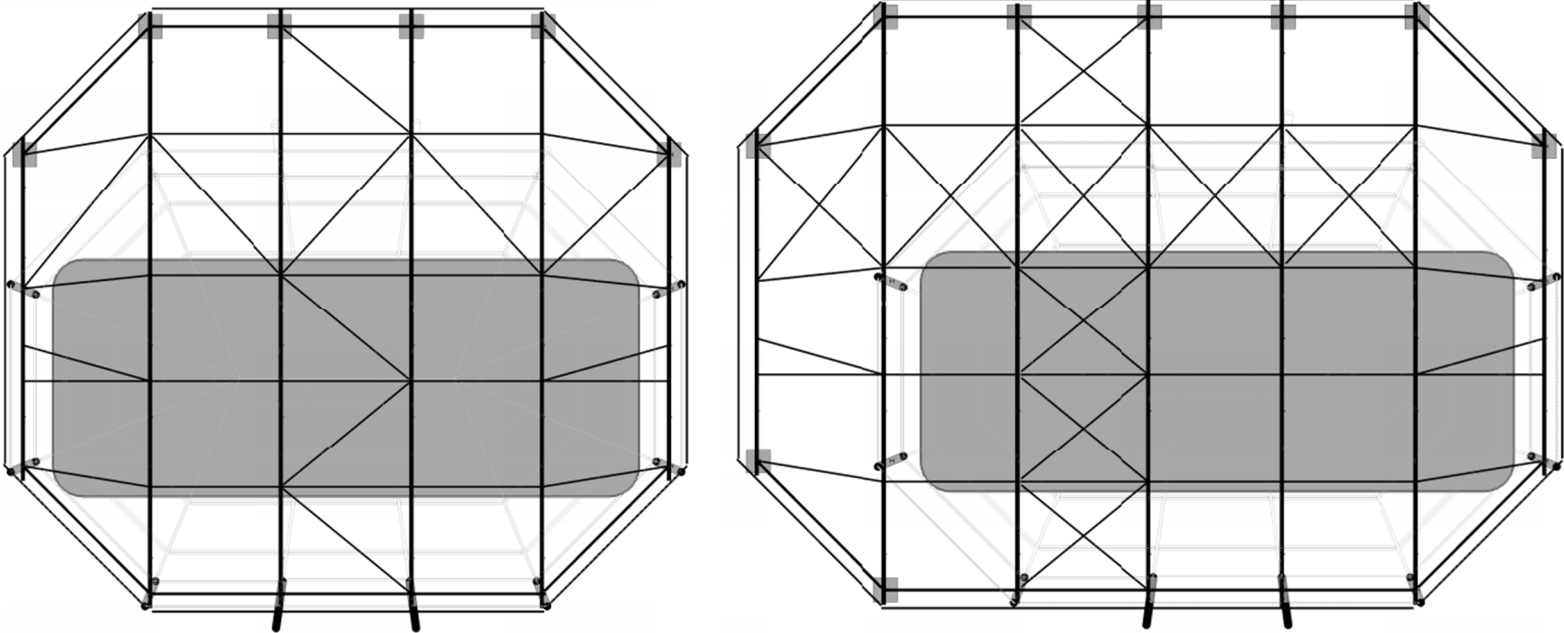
Plans of new roof framing for Schemes 2 and 3 with position of rink shaded
